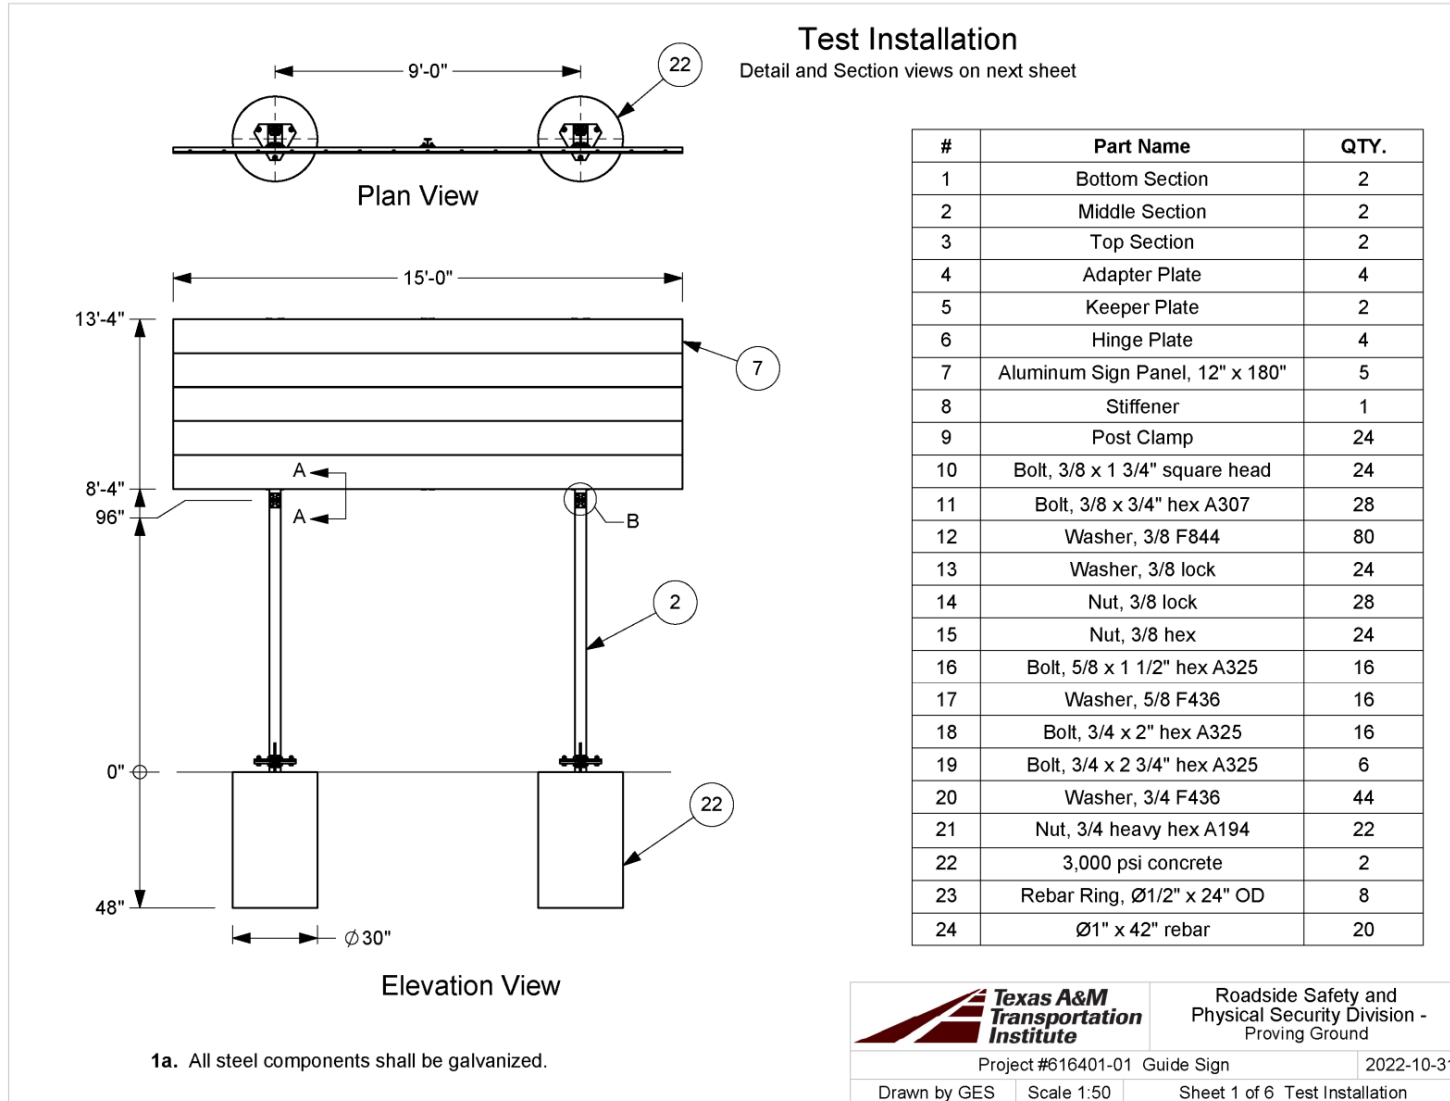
Details of Guide Sign with Large Sign Supports for Test 616401-01-3.
